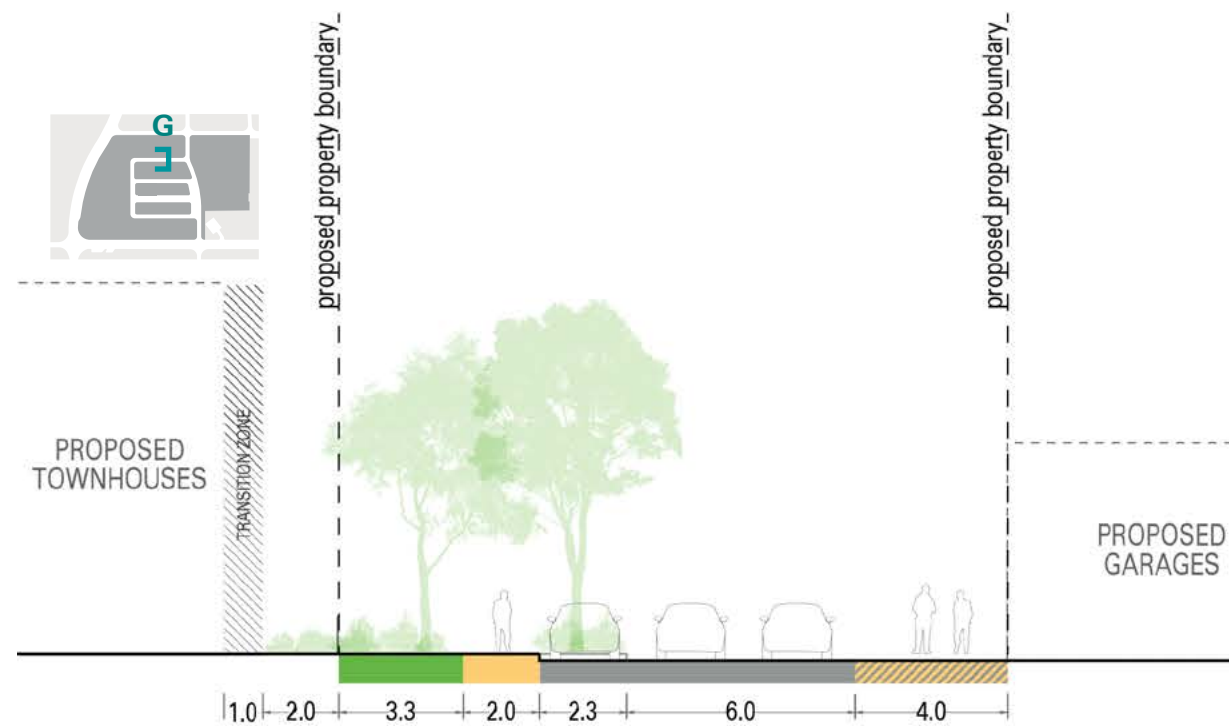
Section G: Precinct Street (East-West) (1:200@A3)
